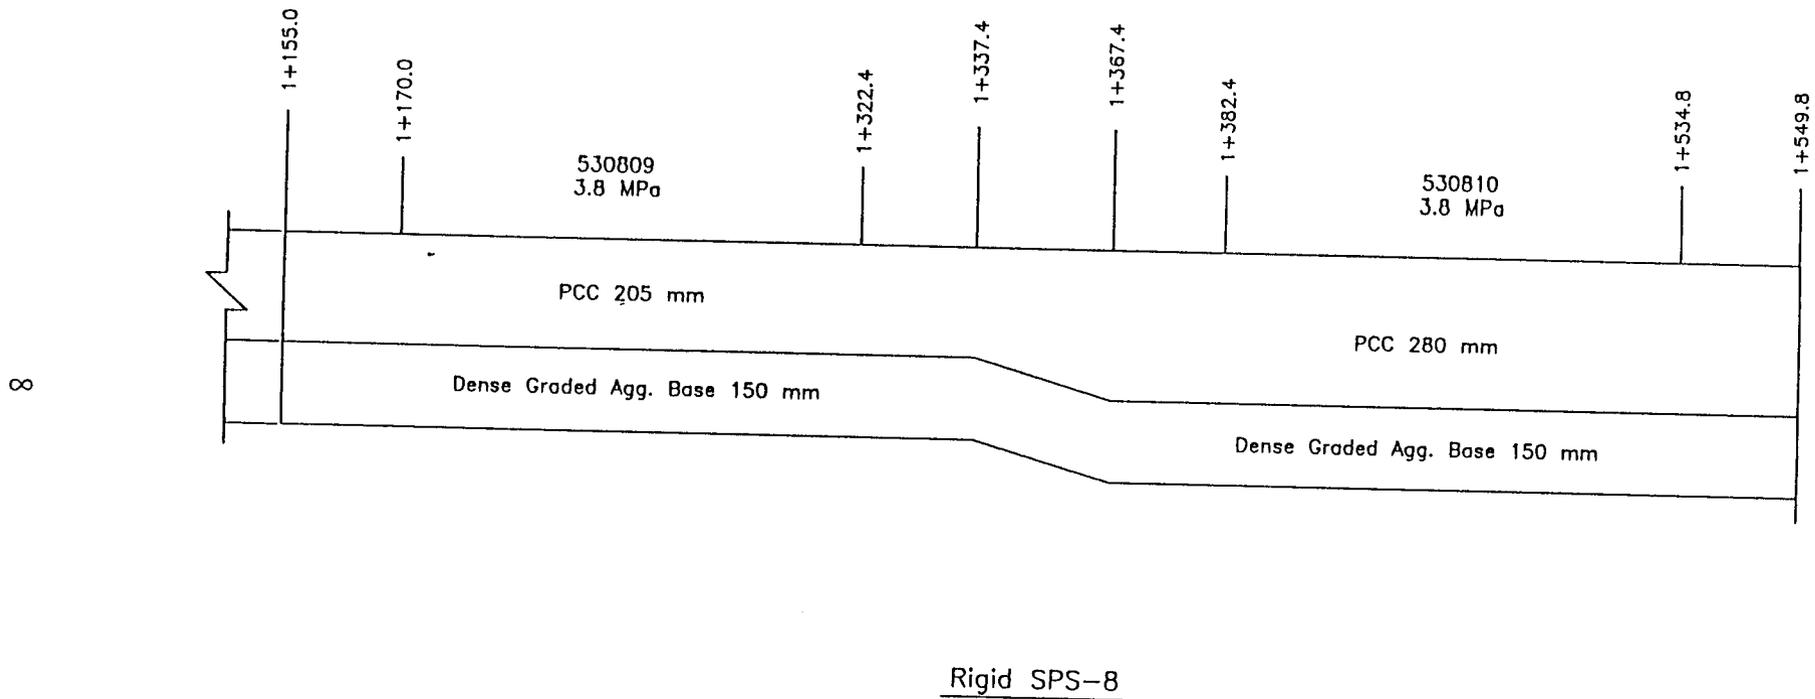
Layout of experimental test sections, Washington SPS-8 project
